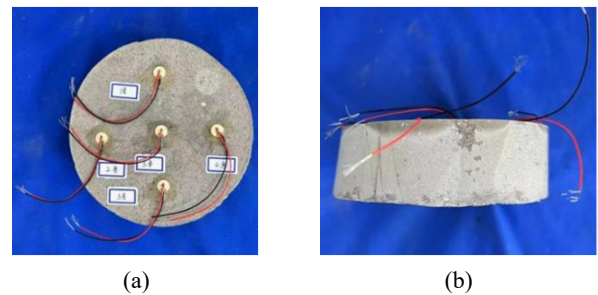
Specimen for grouting stuffing damping test in (a) vertical view; and (b) side view
